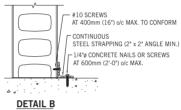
Single Steel Bracing with Strapping on One Side - Bottom Detail
